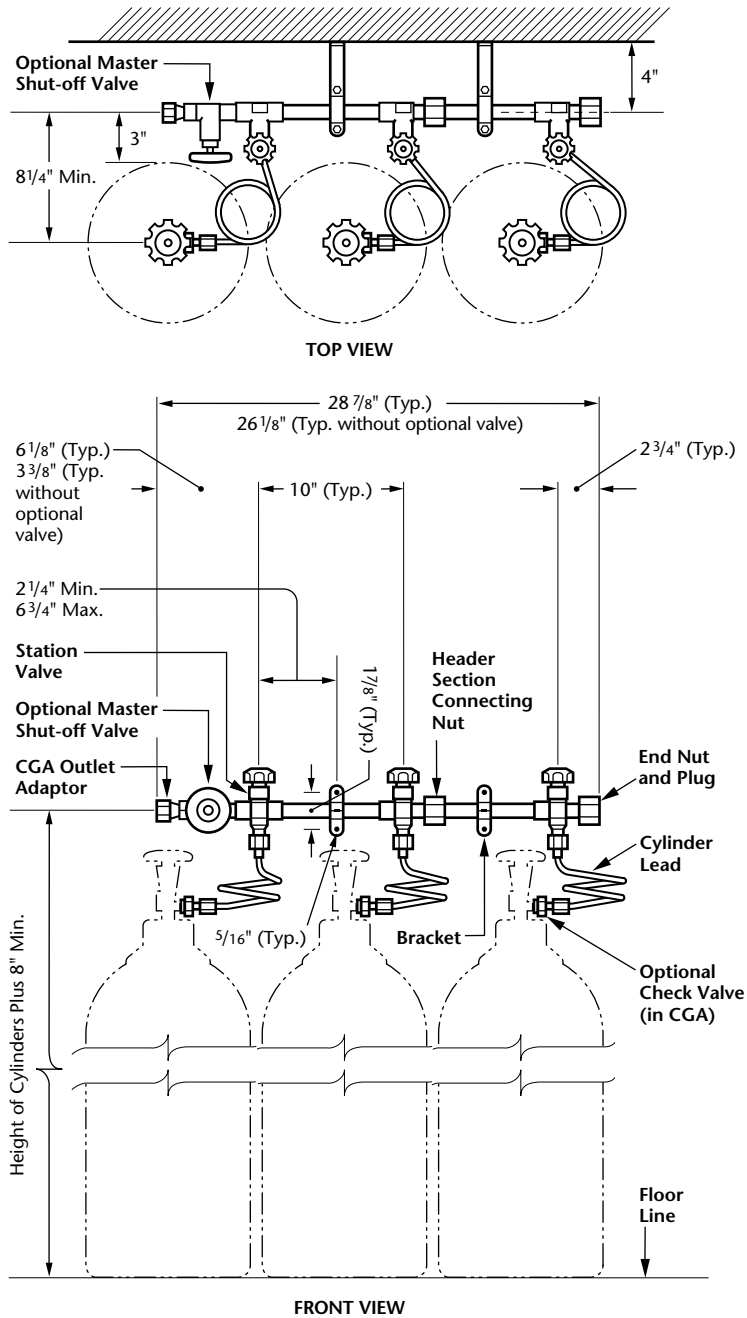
Typical Installation of a Single Row (SR Series) Manifold
